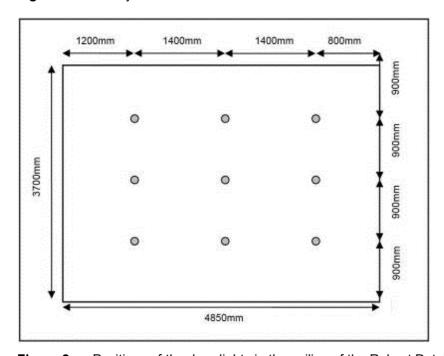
Positions of the downlights in the ceiling of the Robust Details Appendix F floor
